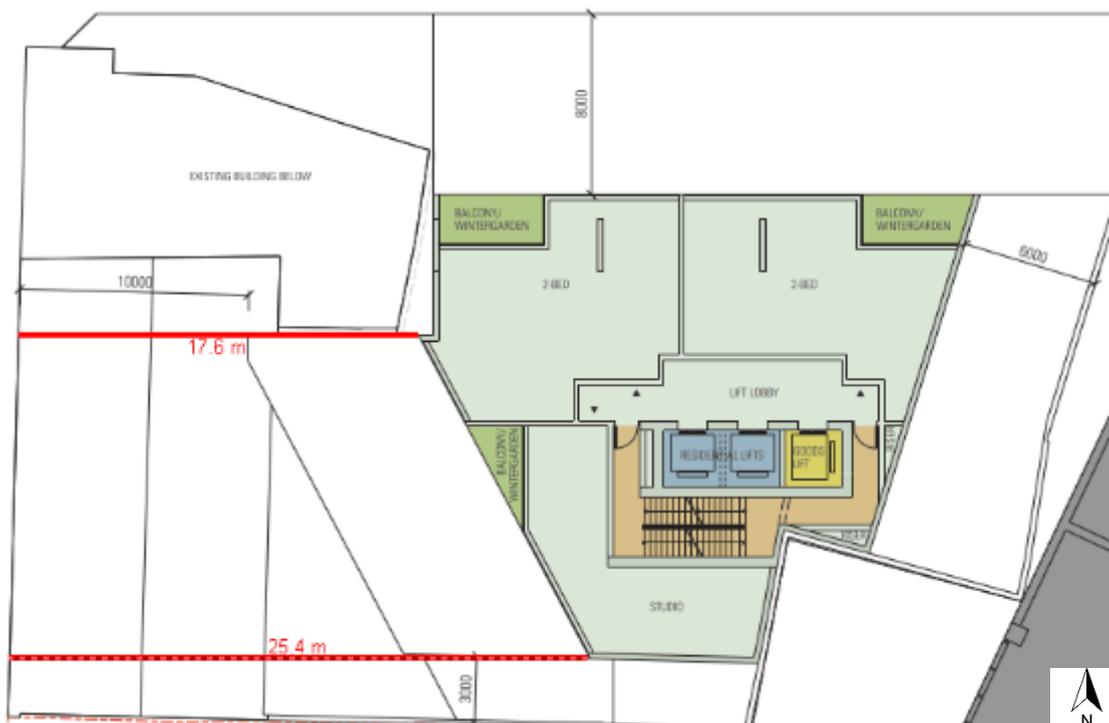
At levels 22-25, the tower is required to be setback between 17.6 metres and 25.4 metres from the George Street frontage
